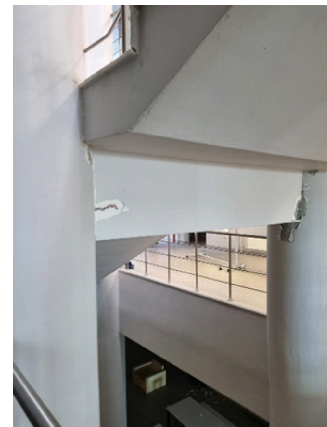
shows representative examples of observed damage in school buildings. Typical damage in these multi-story RC structures with unreinforced masonry infill walls include: (1) diagonal shear cracks in infill walls and separation from the surrounding beam-column frame (Figs. 4.8a,b), (2) cracks in the staircases (Fig. 4.8c), and (3) other nonstructural damage including damage to suspended ceilings (Fig. 4.8b).
